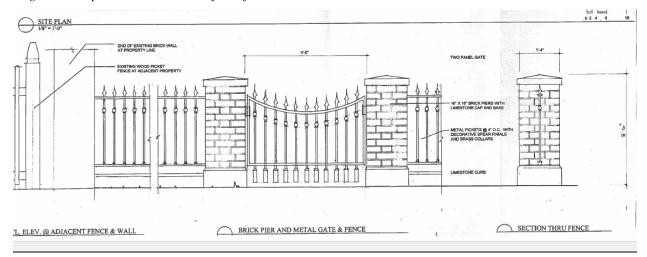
Proposed brick and metal fence for 700 S. Pitt Street.
